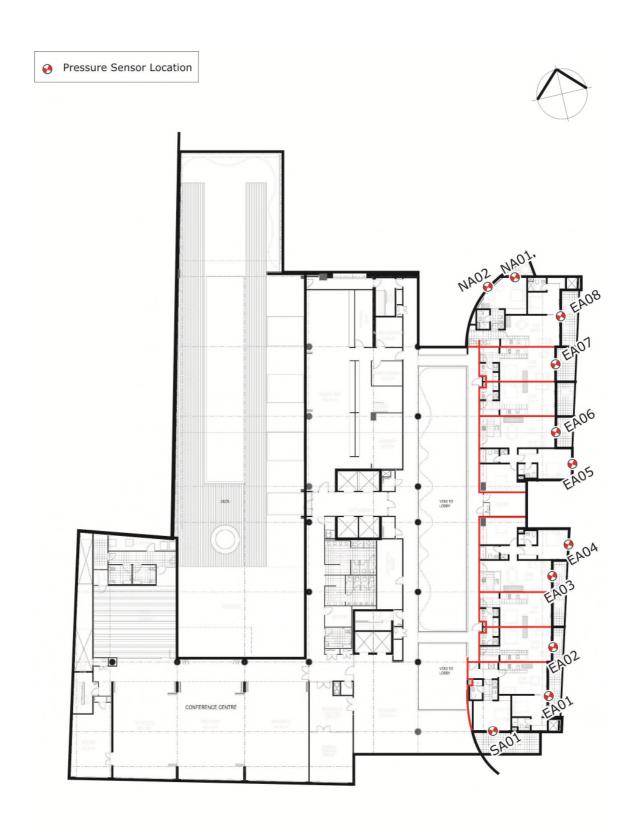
Opening Locations and Internal Apartment Layout - Level 1
